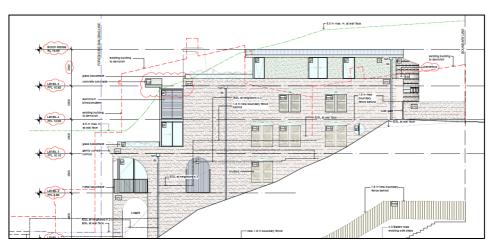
East Elevation (extract from DA13 A) Source: Source: Luigi Rosselli
